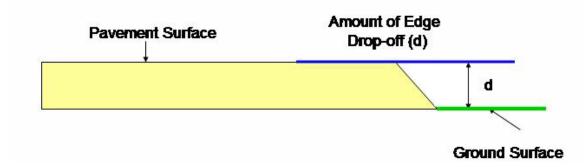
Measurement of Pavement Edge Drop-Off Perpendicular to Pavement Surface
